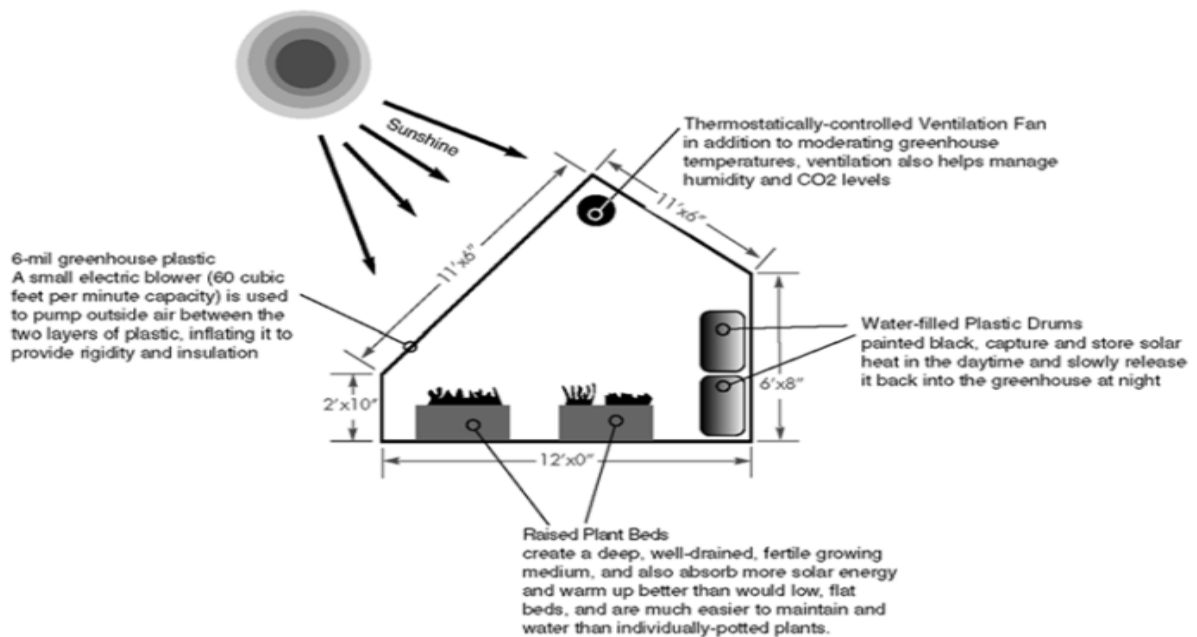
Schematic of the construction of a solar-heated greenhouse [1]
